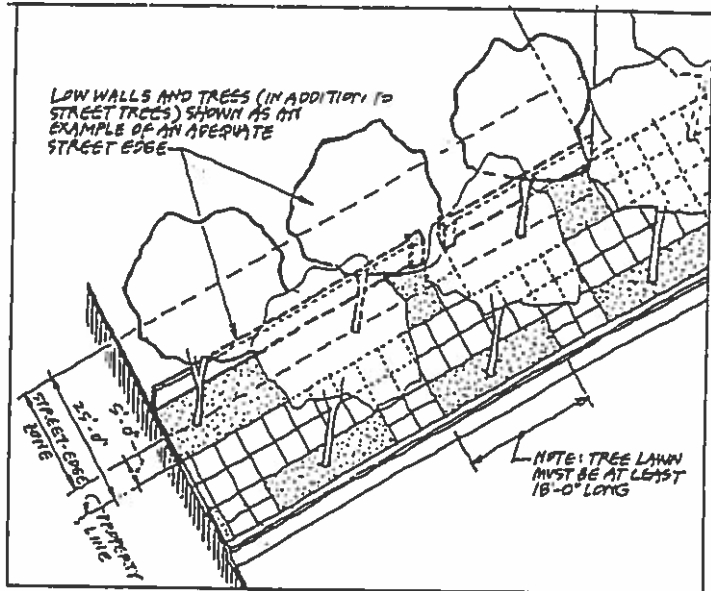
A EXAMPLE OF ONE POSSIBLE OPTION FOR PROVIDING A STREET EDGE WITHOUT BUILDINGS
